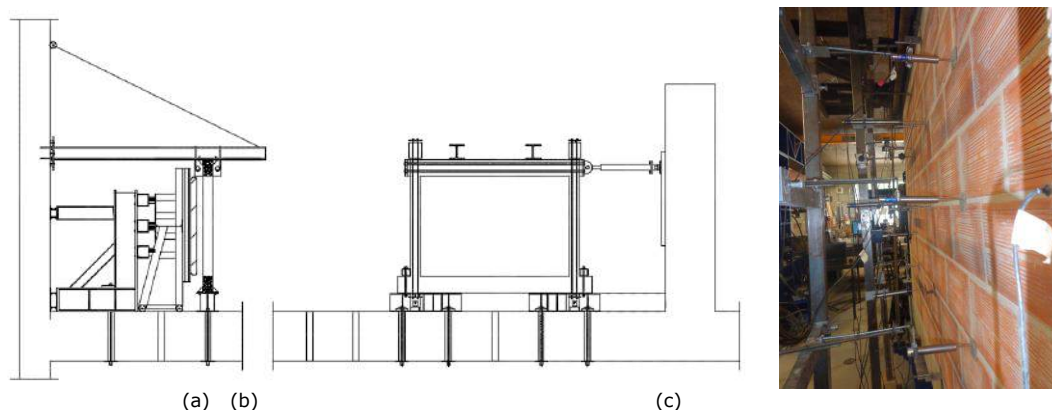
Tests setups for cyclic tests; (a) out-of-plane testing with airbags; (b) in-plane test setup; (c) instrumentation for measuring out-of-plane deformation of the brick masonry infill wall.
